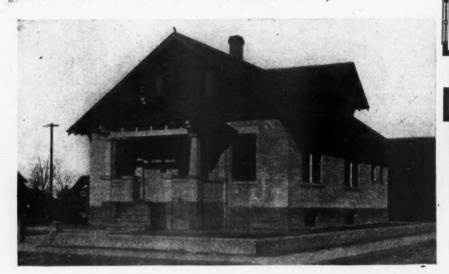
Home of Louise Auziek, Pueblo, Colo., Also of Double Wall Concrete Block Construction, Similar to the Building Shown in Figure 1.
